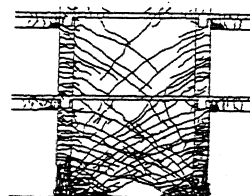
Final Crack Pattern of Half-Scale Three Story Shear Wall Tests<sup>3</sup>
